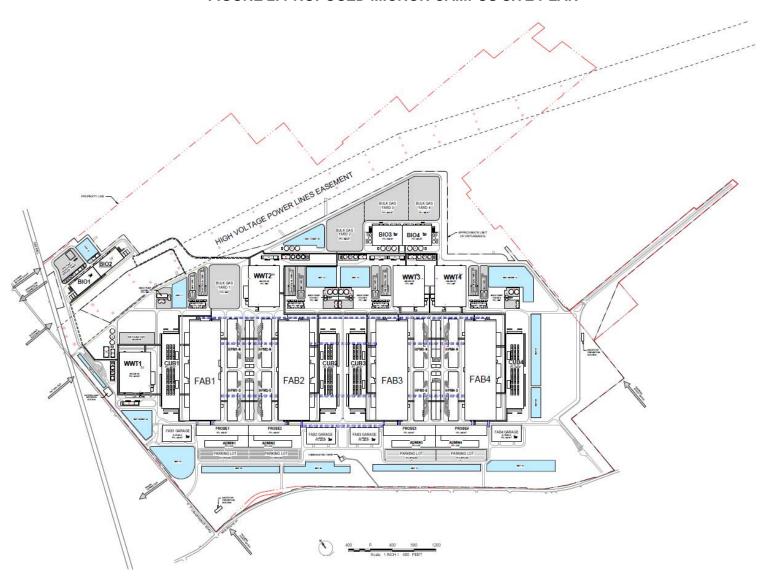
PROPOSED MICRON CAMPUS SITE PLAN
